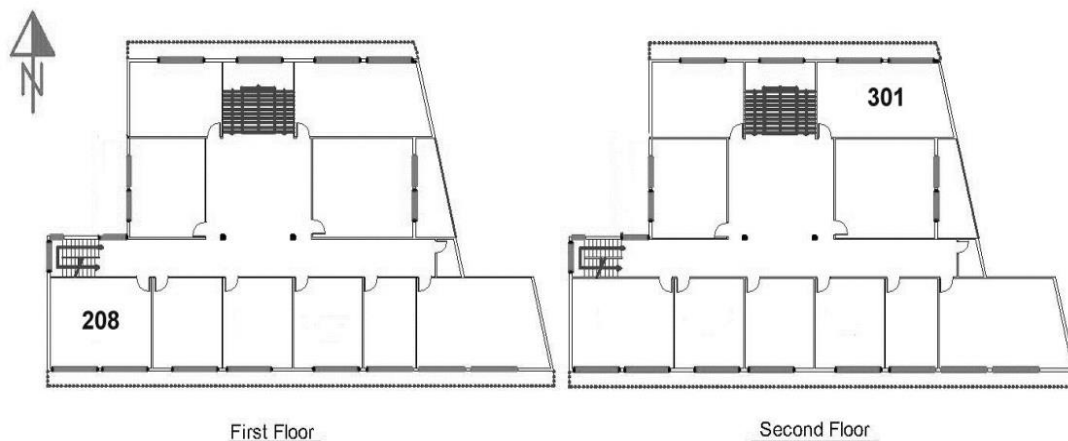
Typical floor plan of school building showing proposed selected classrooms for simulation analysis
